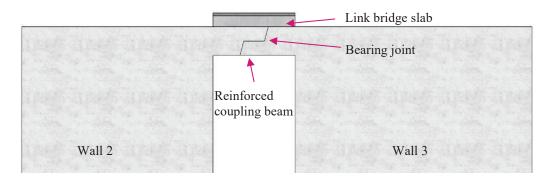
The lift and stair core walls are connected via a coupling beam with a bearing joint at the centre.
